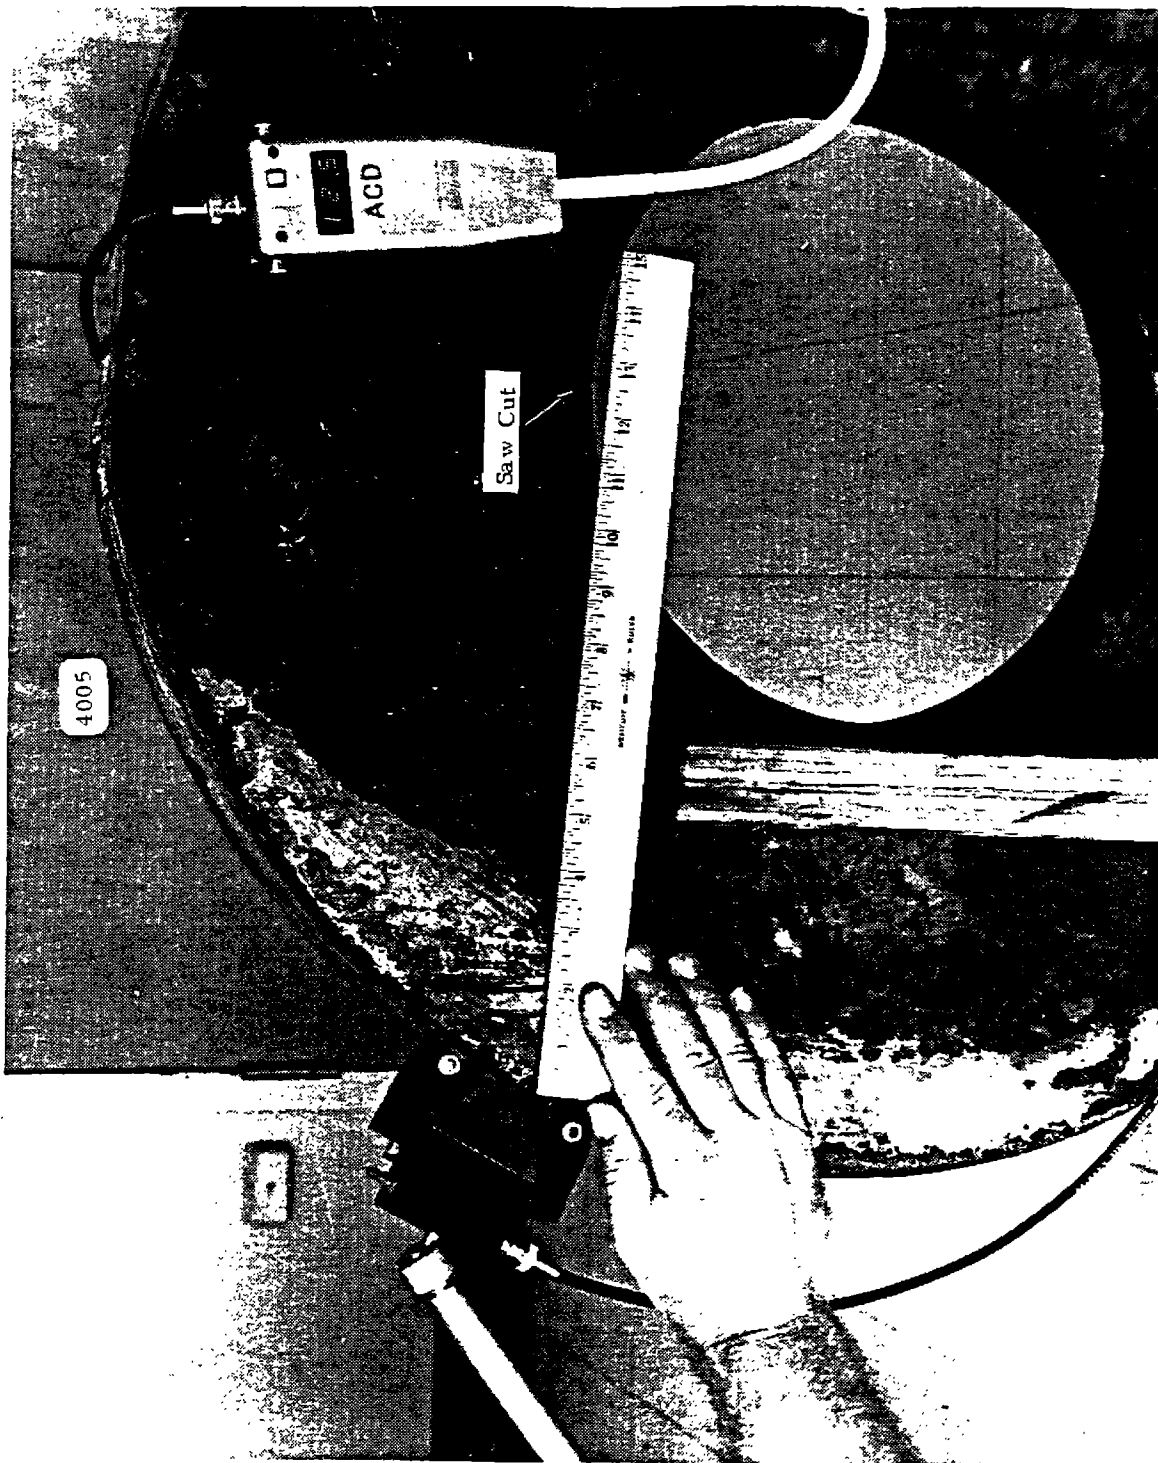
Crack (Notch) Signal of 1.31 Inches on Silver Bridge Eye-Bar Specimen (5)
